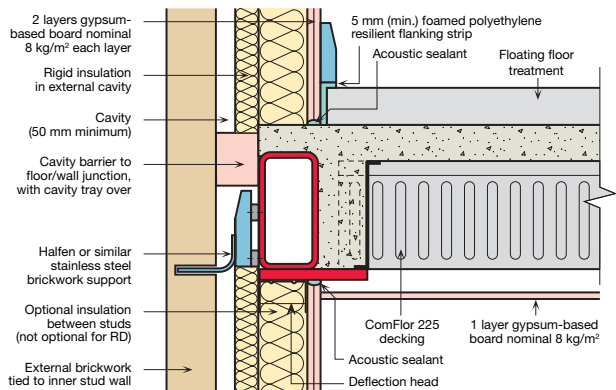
Acoustic detailing at junction between floor and external wall with RHSFB
